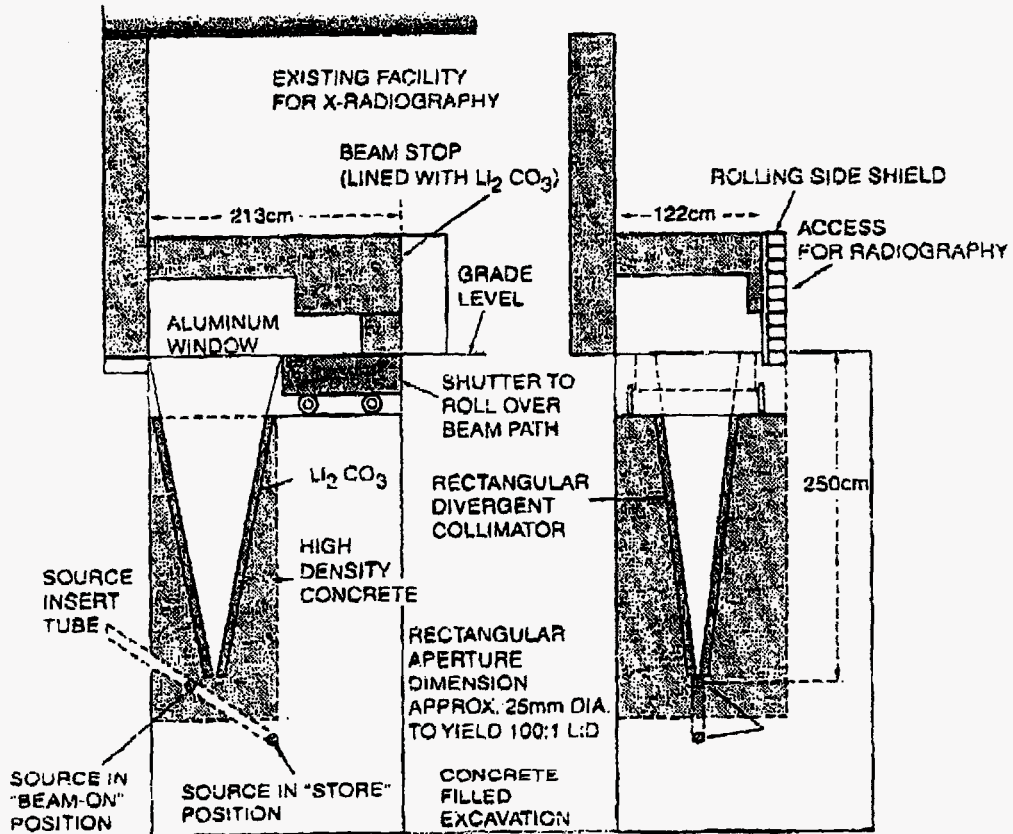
Plan of proposed neutron beam stop in corner of existing x-ray facility
